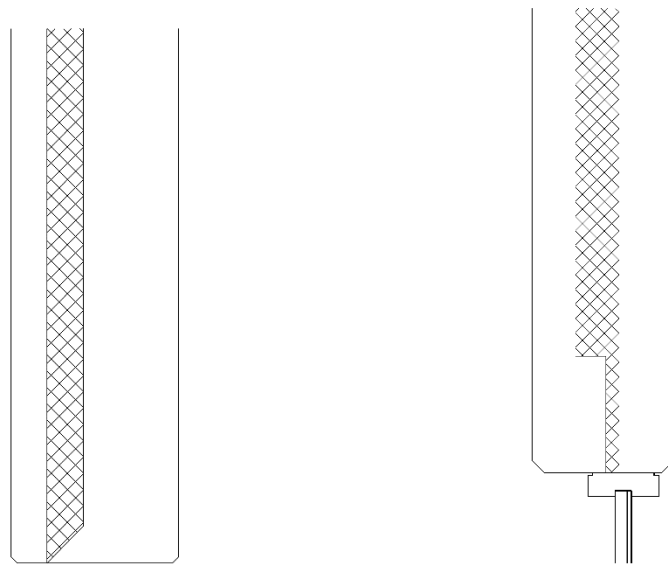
Sample of improved details that prevent moderate thermal bridging around windows and doors
